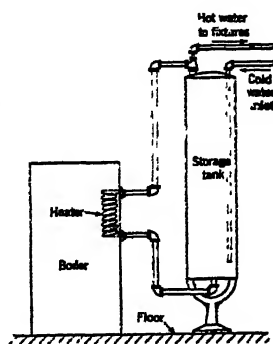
INDIRECT WATER HEATER PLACED IN BOILER
